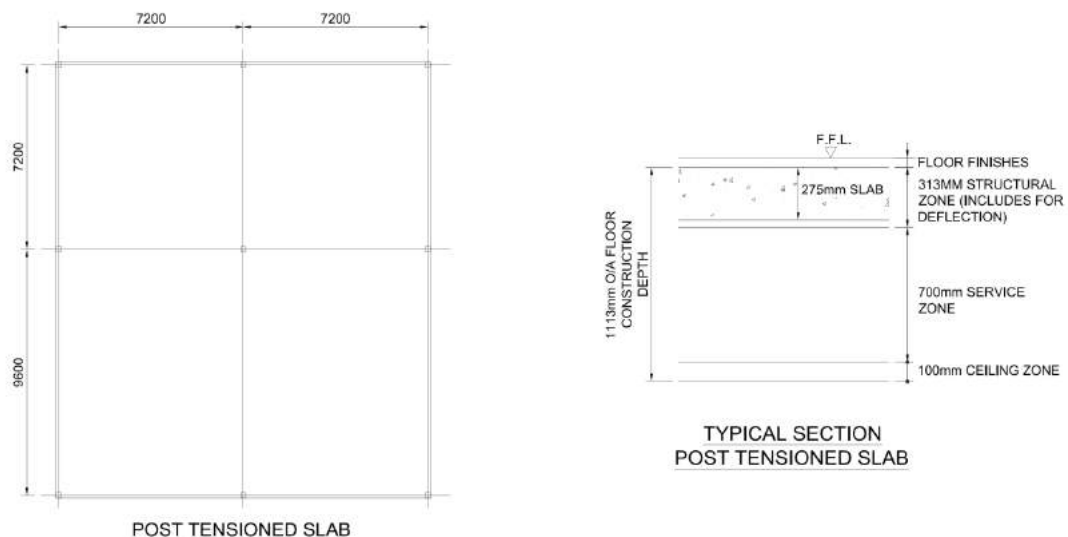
General arrangement and section for a concrete frame and post tensioned slabs
